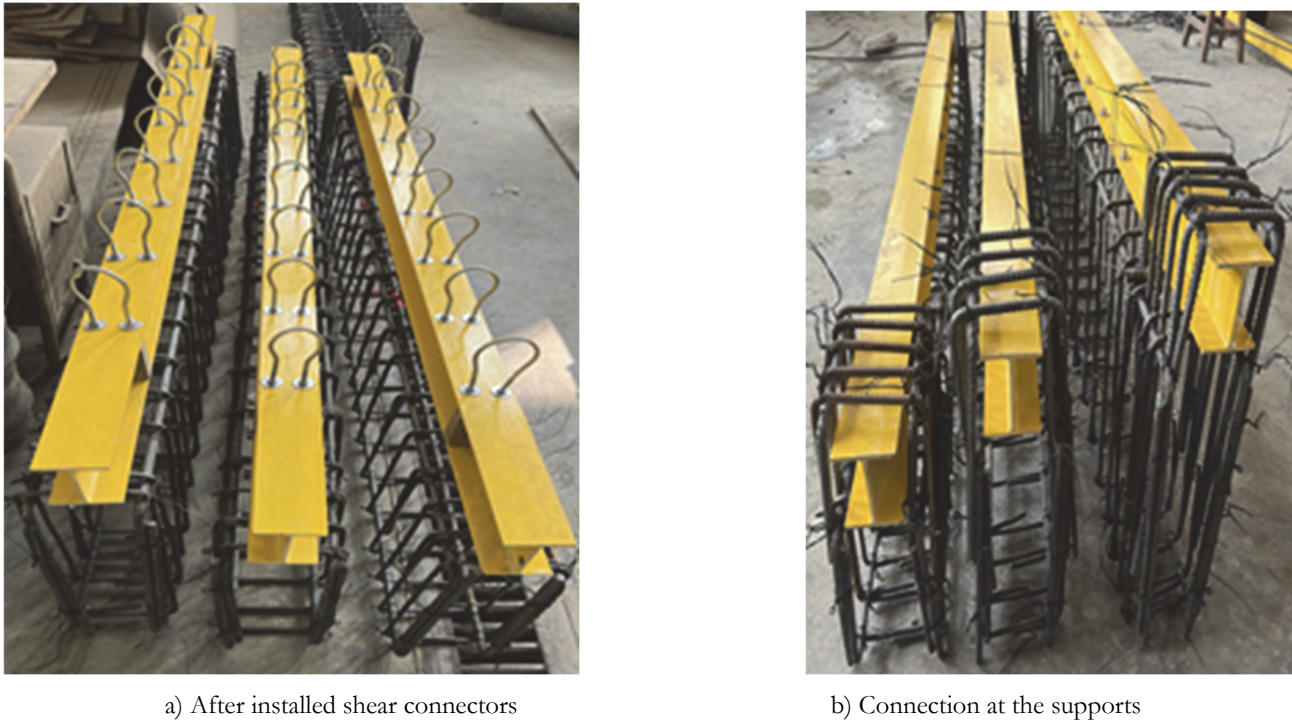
Steel mesh and concrete of composite beam with external GFRP I-section.
